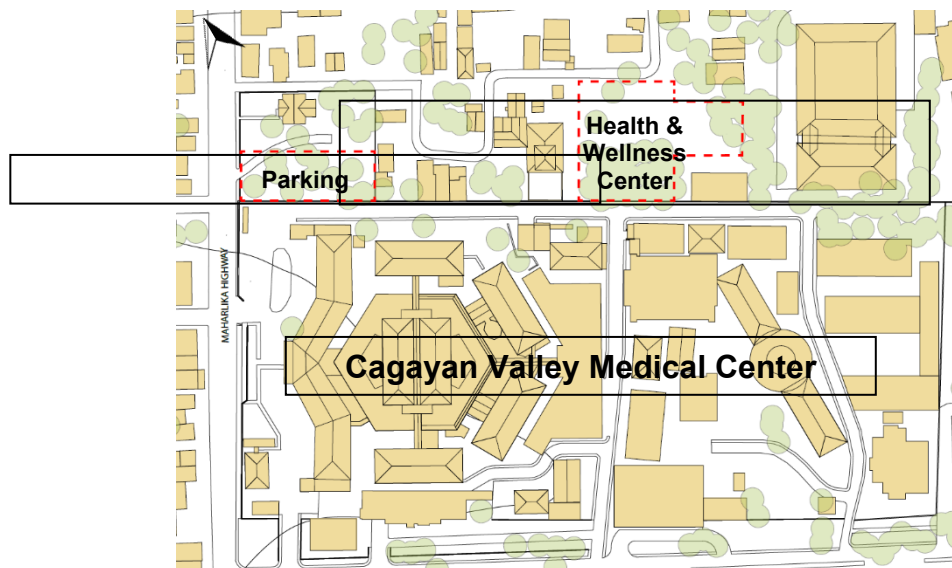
Existing Site Plan with Proposal (Source: drawn by author)
